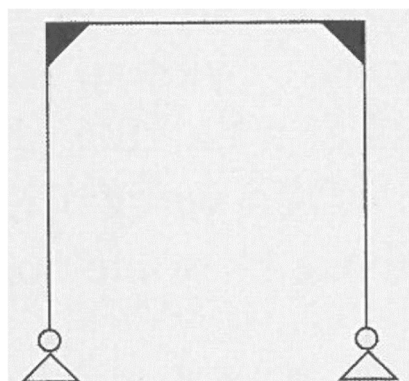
Rigid frame system (Wyatt, K., Hough, R. 2013)
